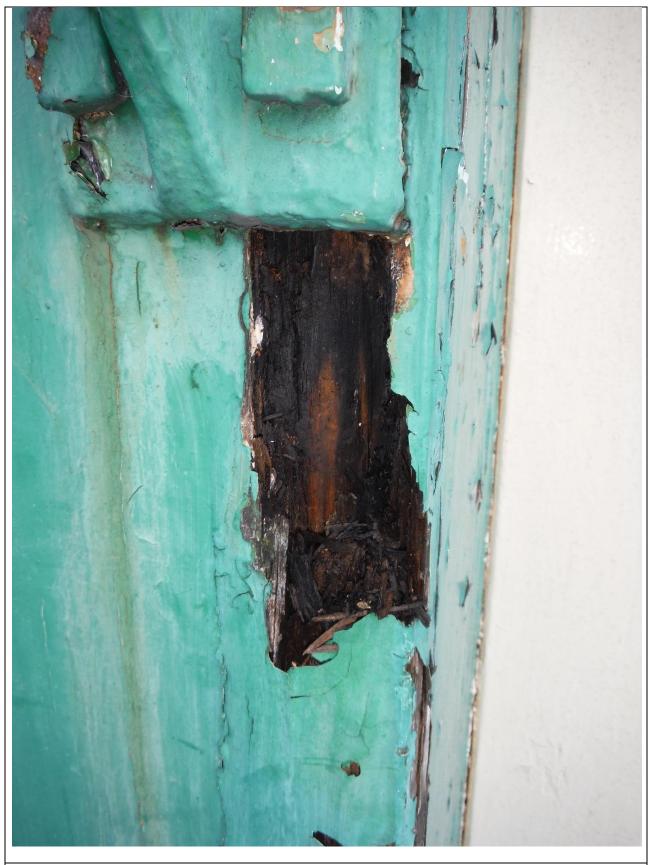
Wet rot of timber at steel T-section connection at westernmost corner directly below roof leak (Platform 2)
